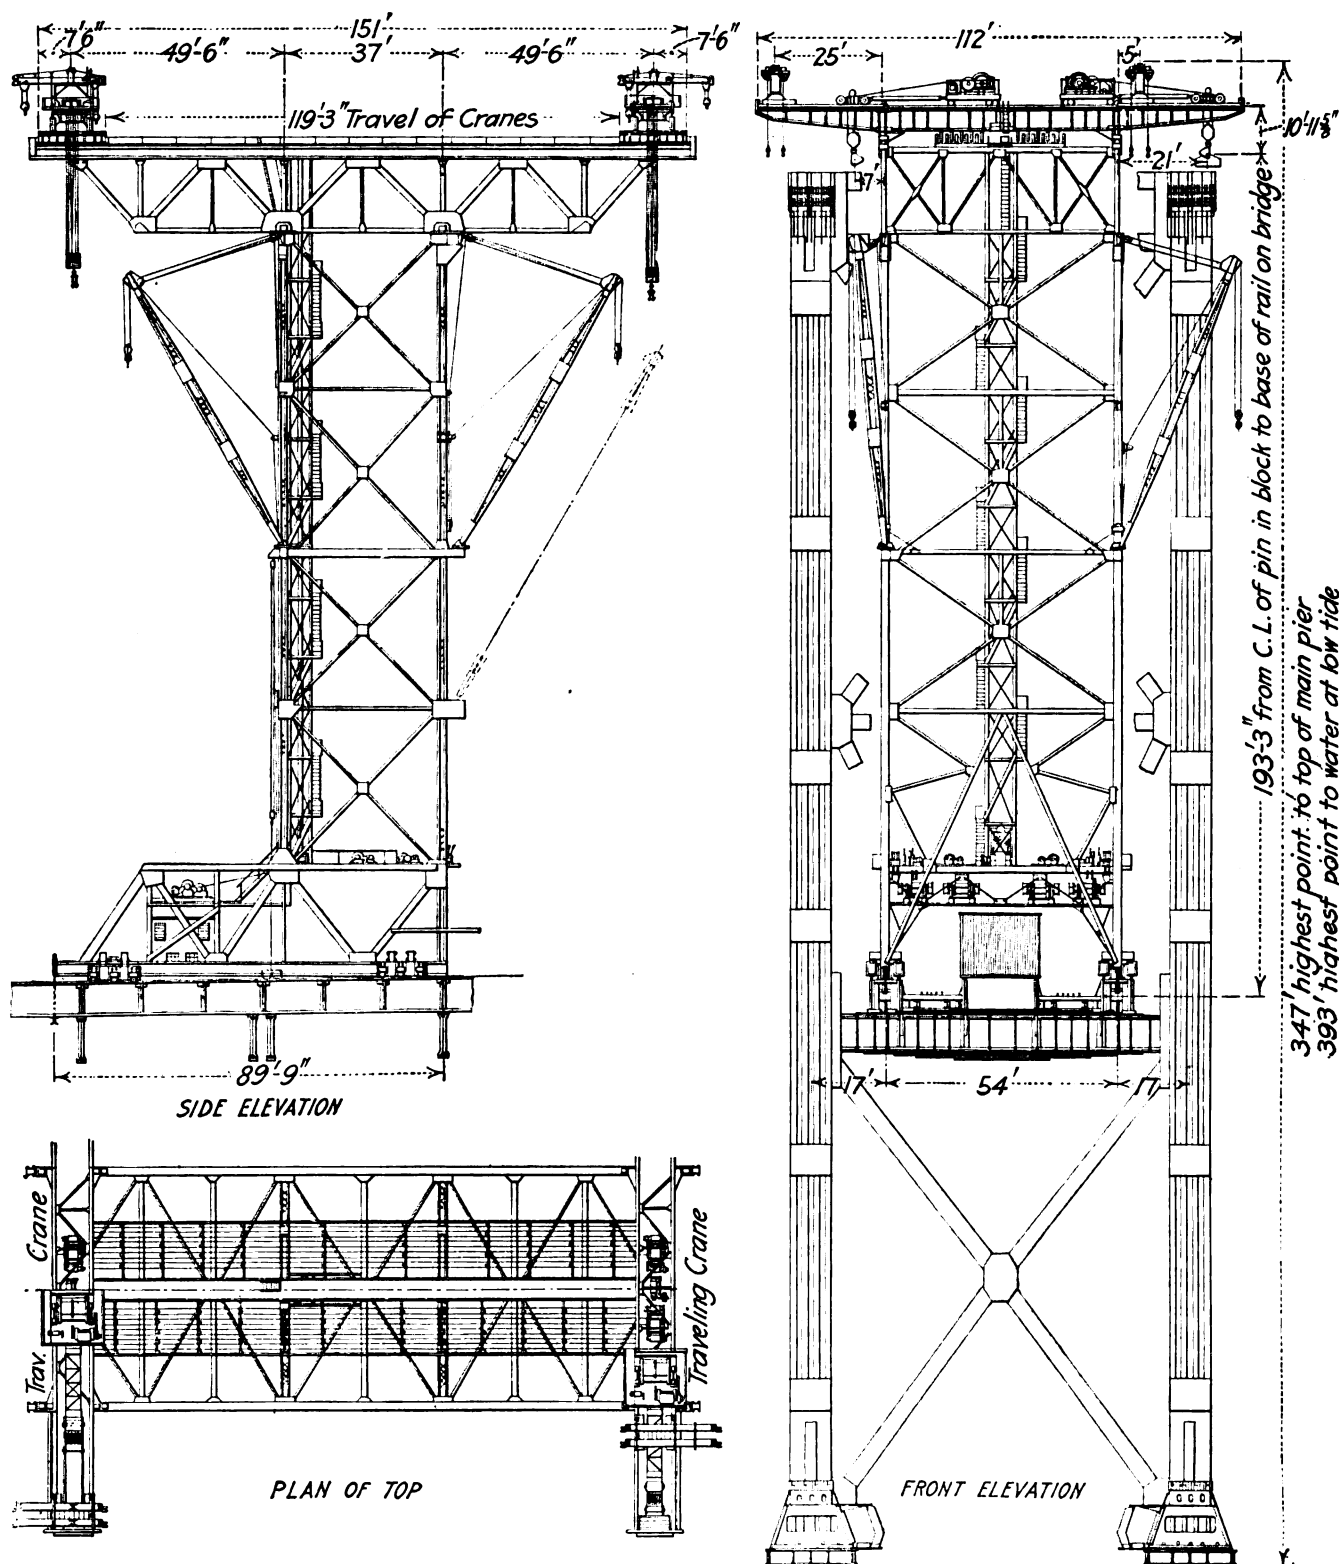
ERECTION TRAVELER FOR THE QUEBEC BRIDGE
